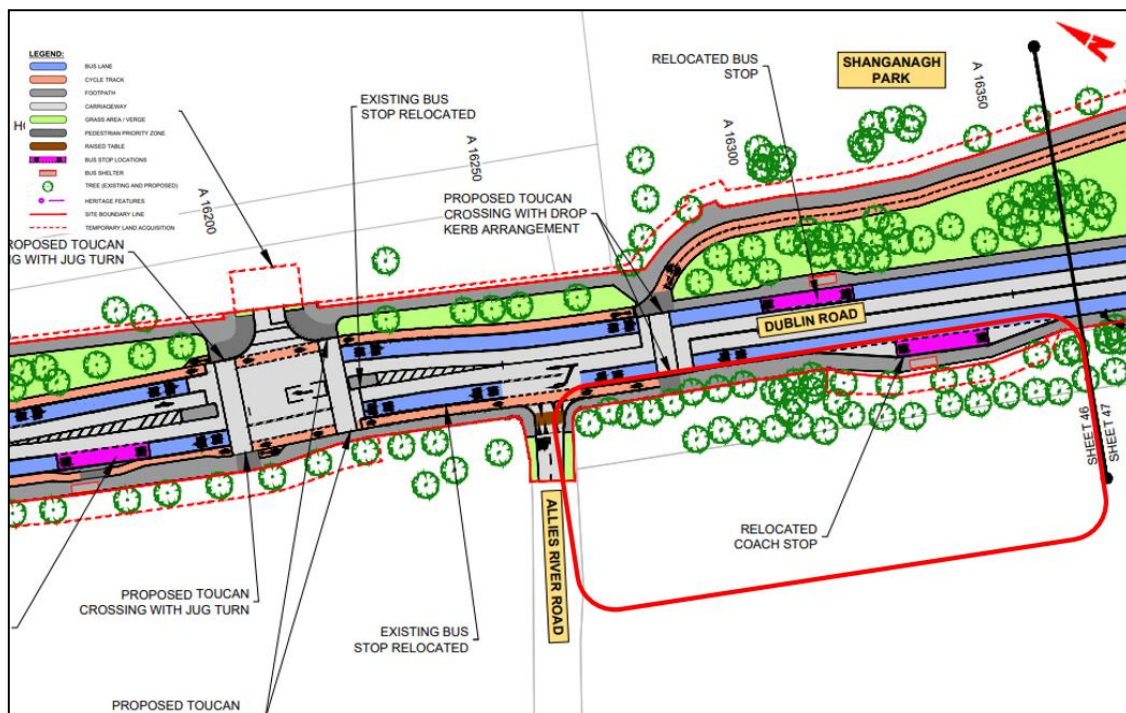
Extract from General Arrangement Drawings on Dublin Road (Sheet 46)
